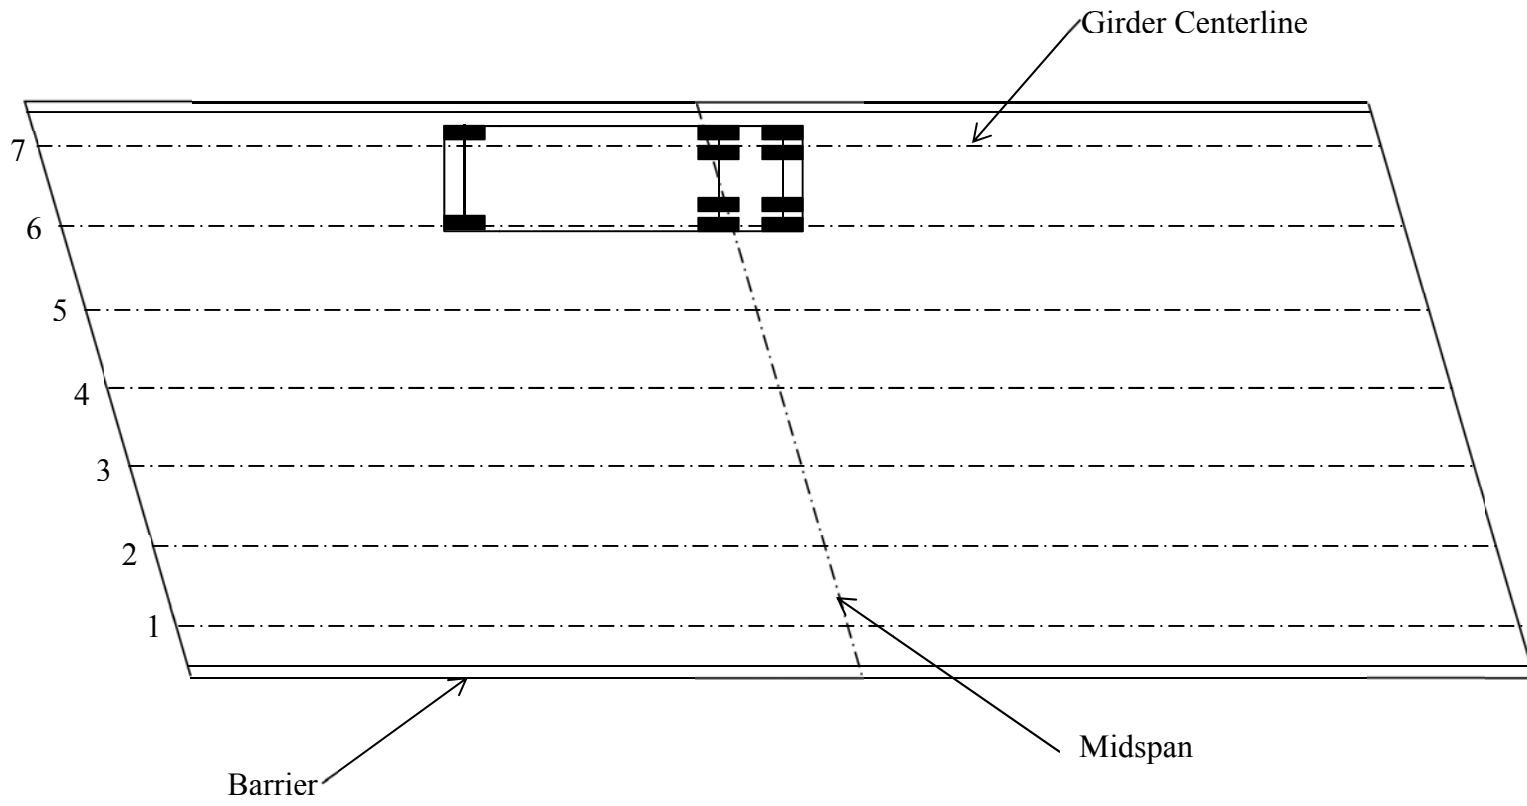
Westbound load truck placement for position A on spans 3 and 4.
